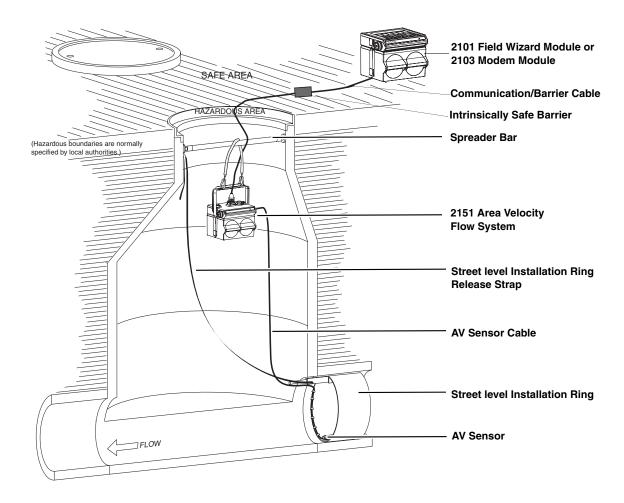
Typical Round-pipe Installation Connected to a 2101 Field Wizard With Cable P/N 60-2004-201
